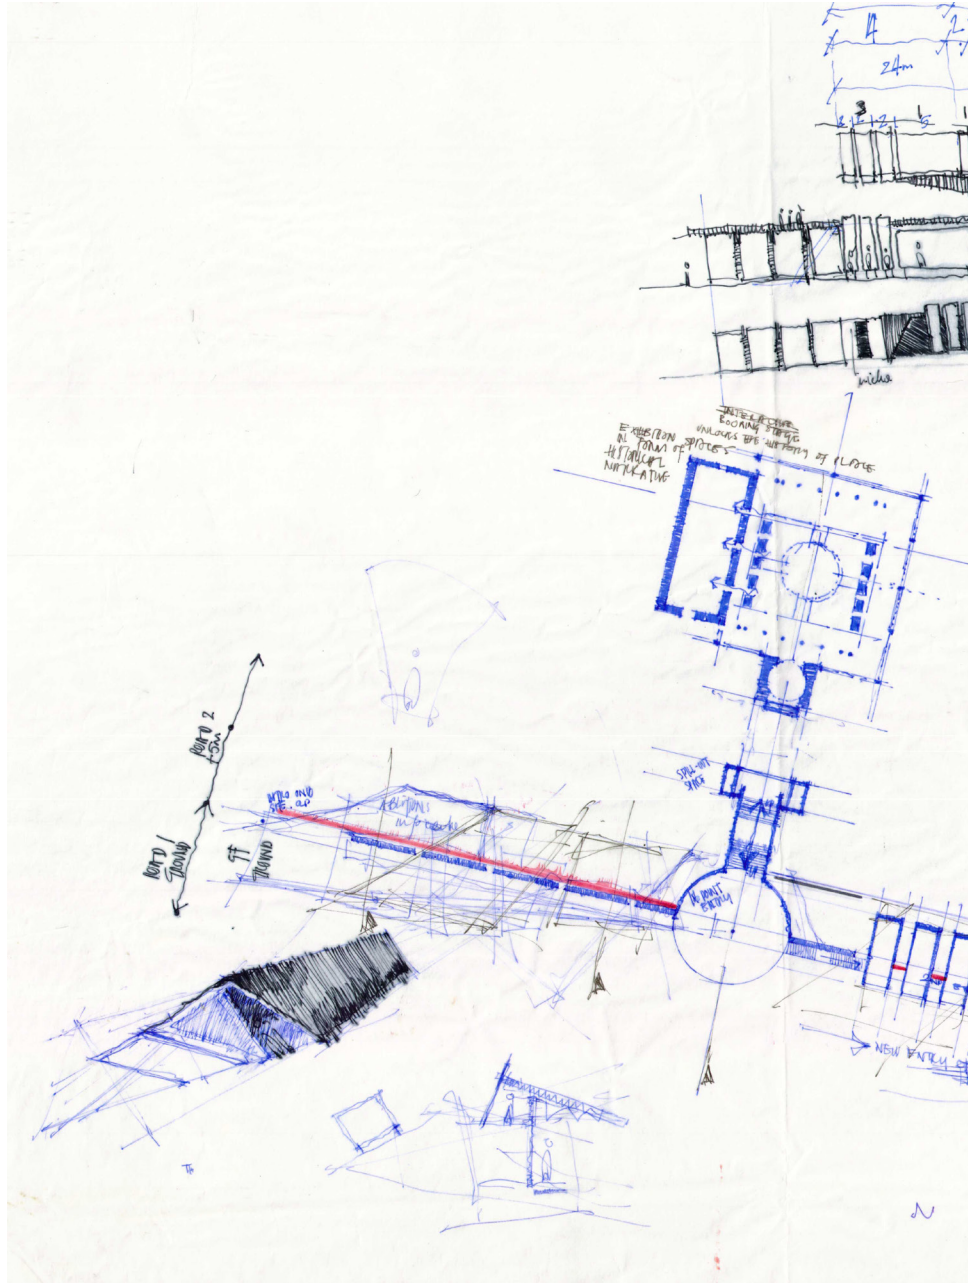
Sketch plan of proposed intervention highlighting the visitors's centre, the politician school and the market space. The red dotted lines indicate the existing walls of the Union Buildings. N.B The drawing is a sketch plan and brought all levels to one drawing to understand the relationship of above ground space and below ground space (Author, 2015)
